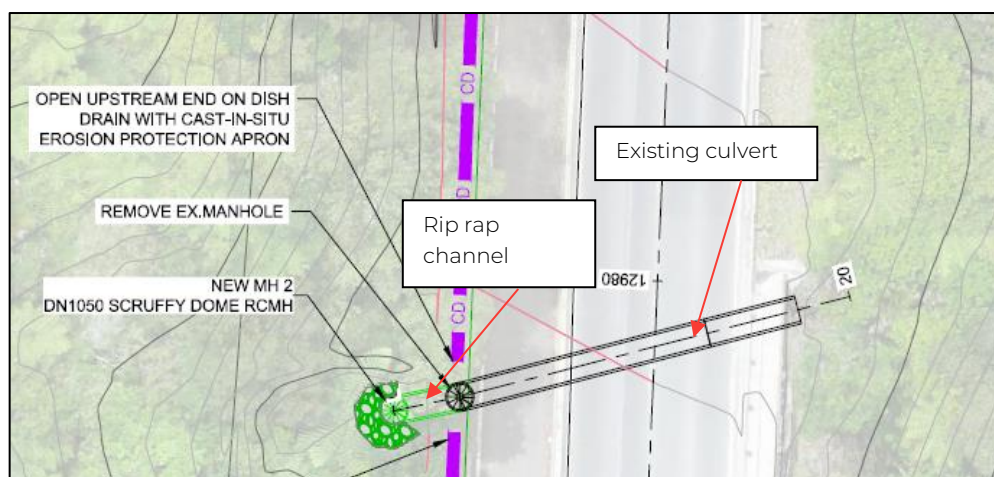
Site G2 existing culvert shown in black and rip rap channel and manhole in green.
